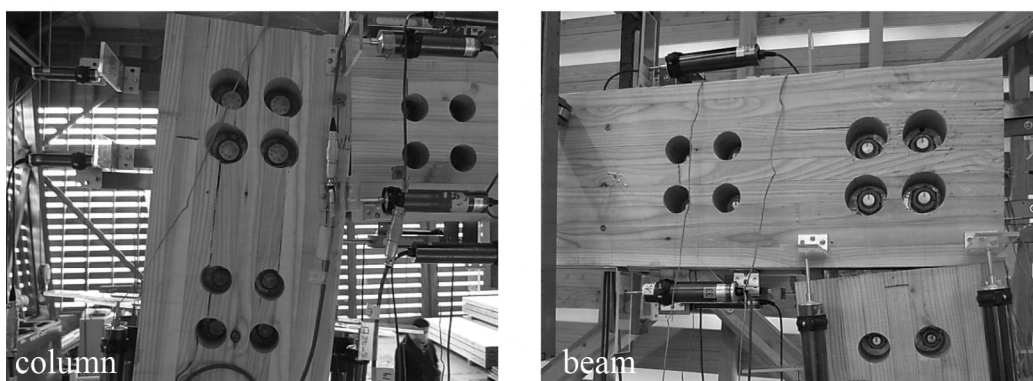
Shear cracks at pre-drilled hole periphery
